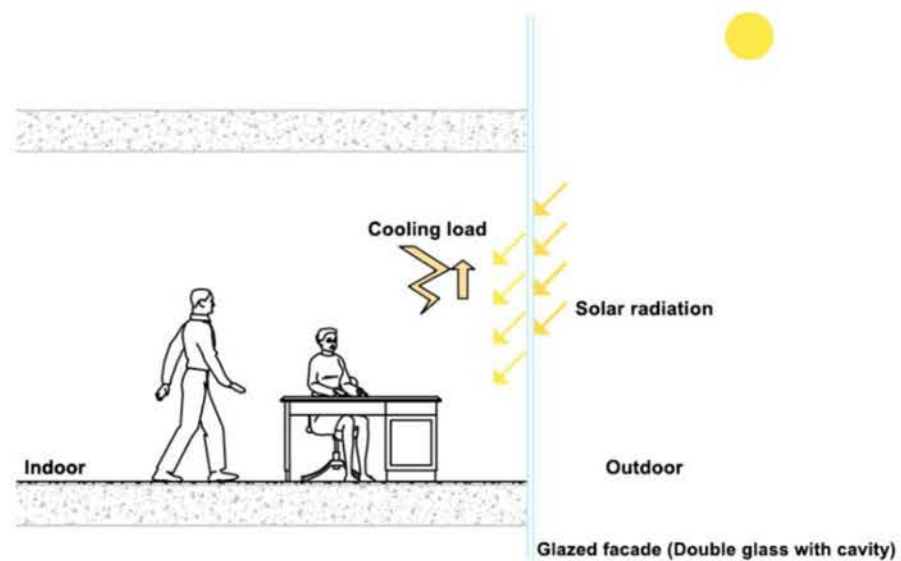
Section drawing to better understand the effect of solar radiation on indoor cooling load in the glazed façade. © By authors.
